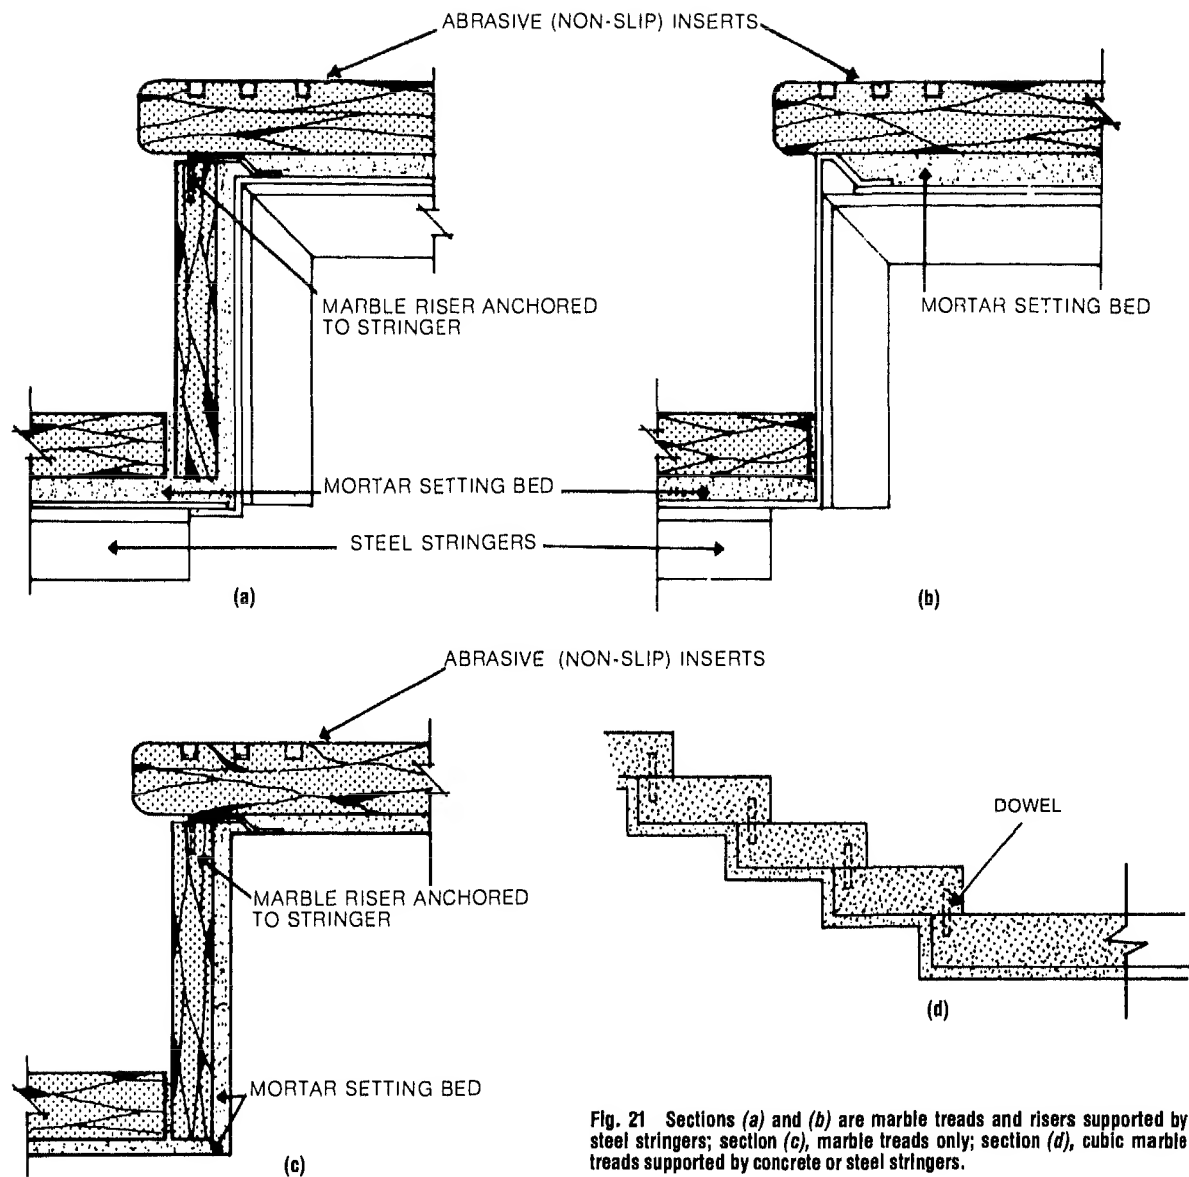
Sections (a) and (b) are marble treads and risers supported by steel stringers; section (c), marble treads only; section (d), cubic marble treads supported by concrete or steel stringers.
